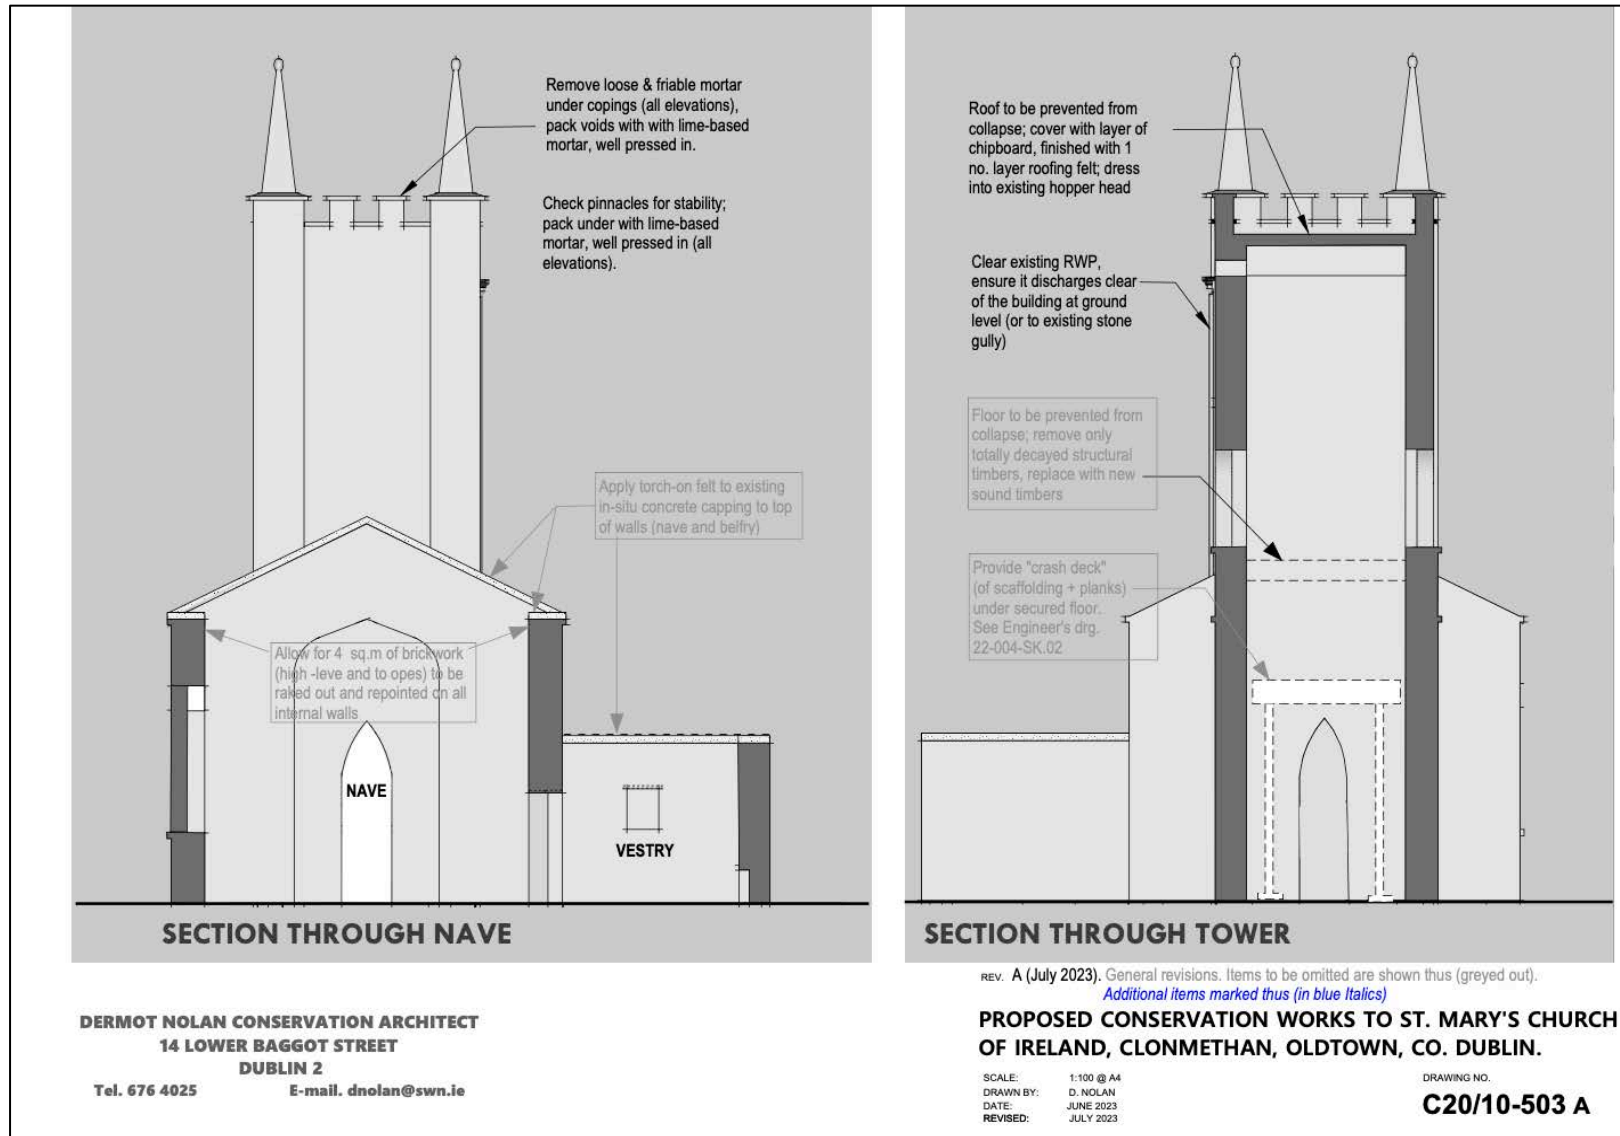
Sections through nave and bell tower with details of conservation interventions (Nolan 2023a).
